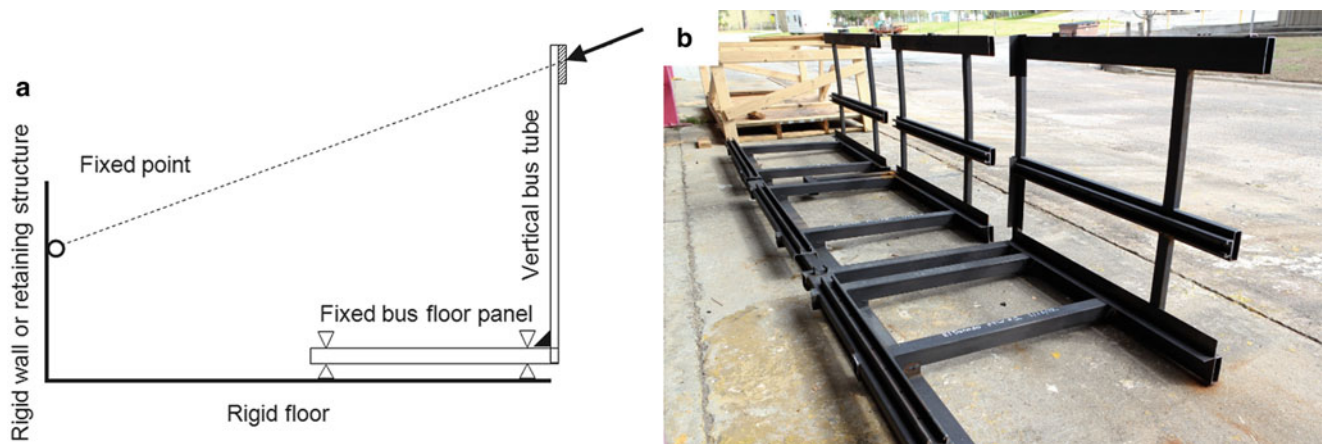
(a) Schematic representation of the wall to floor connection, (b) connection samples prepared for testing
